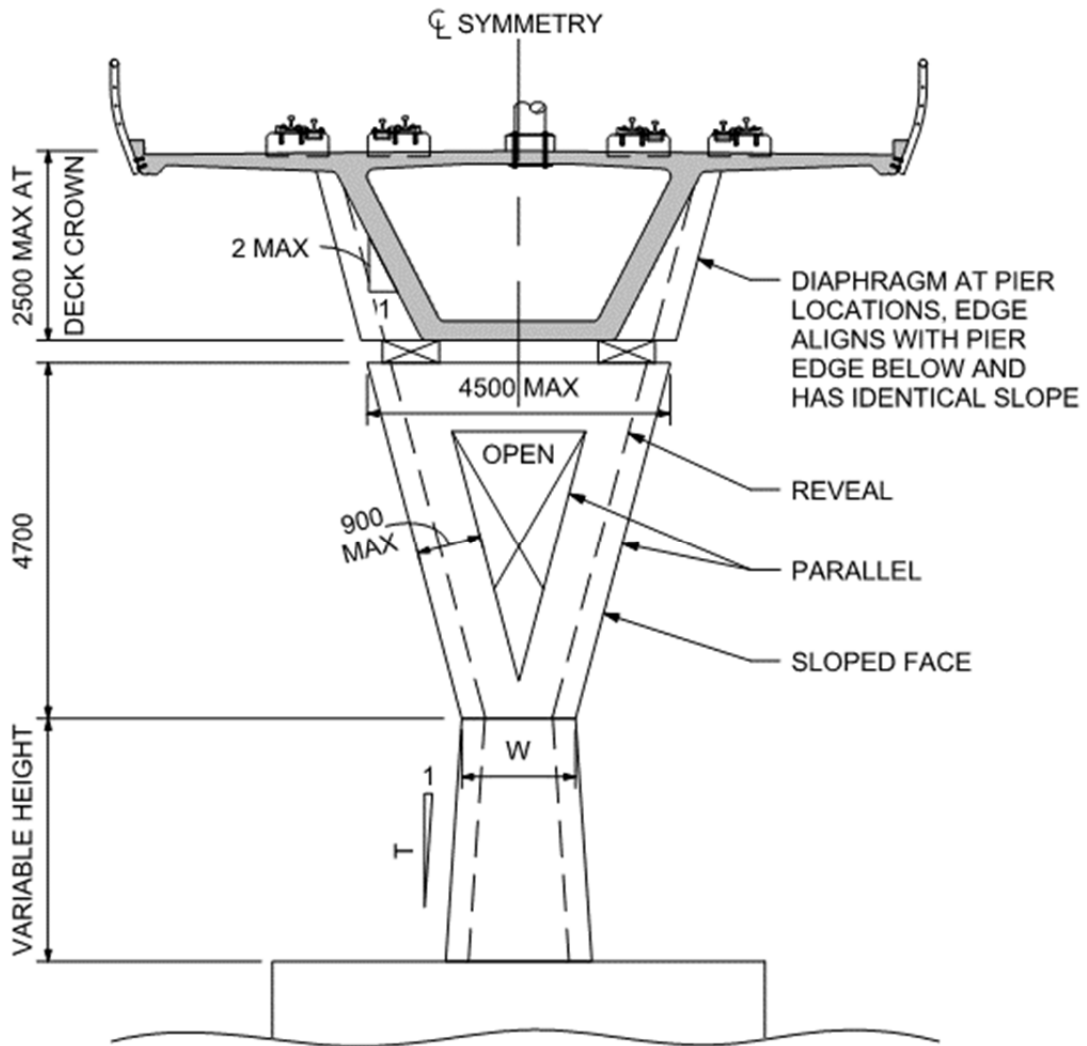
A: Davies Elevated Guideway Section – Box Girder (dimensions in mm)
